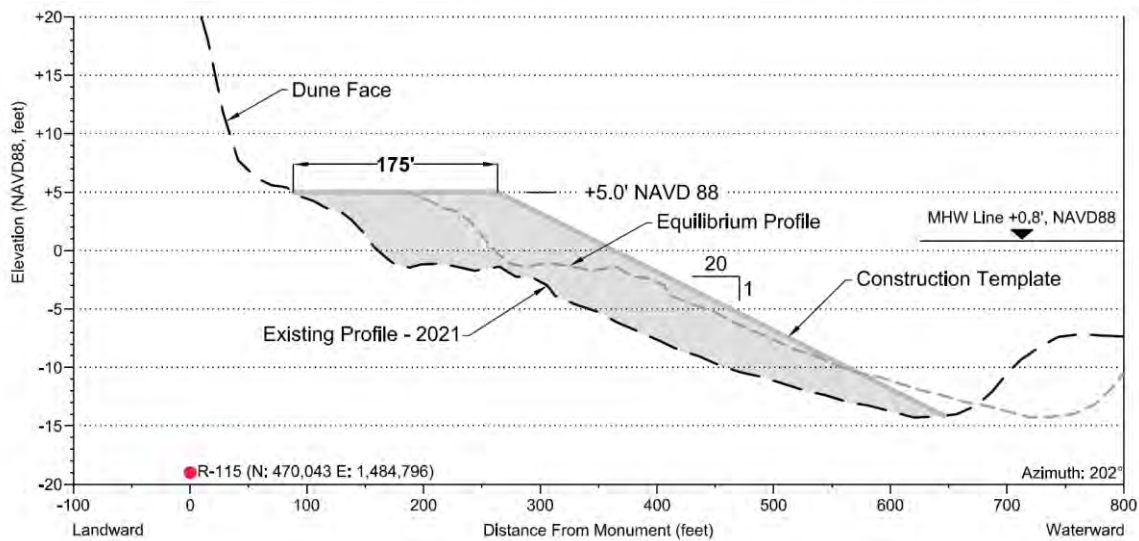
Typical section of proposed fill for the beach and dune restoration alternative.
